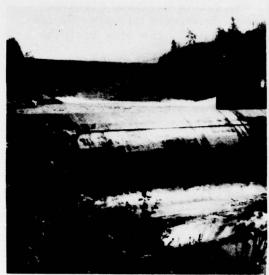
Portland headworks dam Photo II-46. Flow below headworks on Bull Run Piver. dam.
